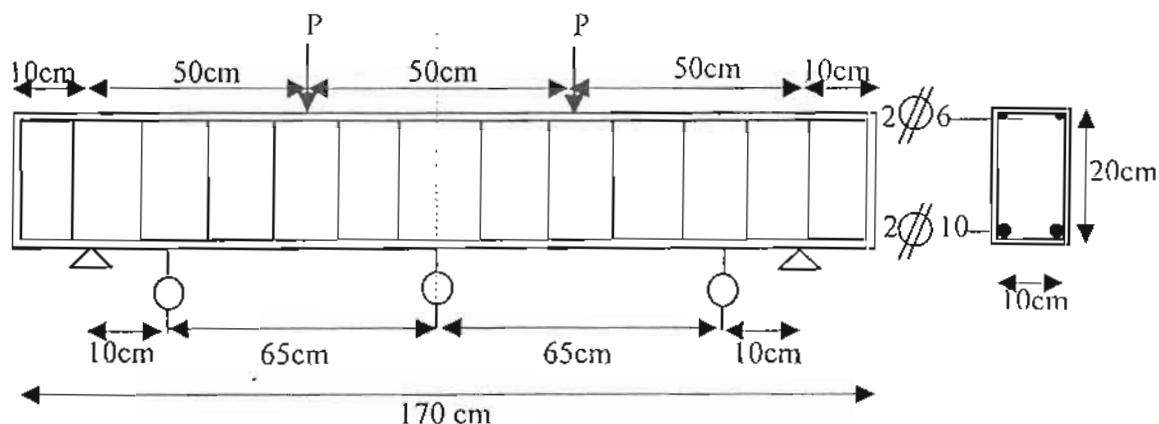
Reinforcement Details of Reinforced Concrete Specimens.
